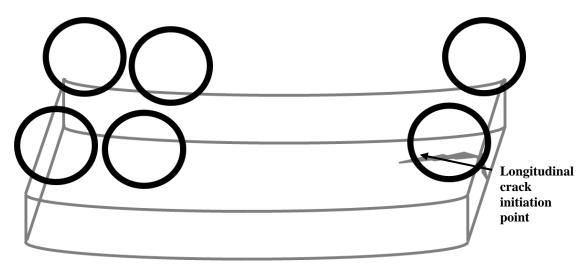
Failure mechanism for longitudinal cracking from field investigation
